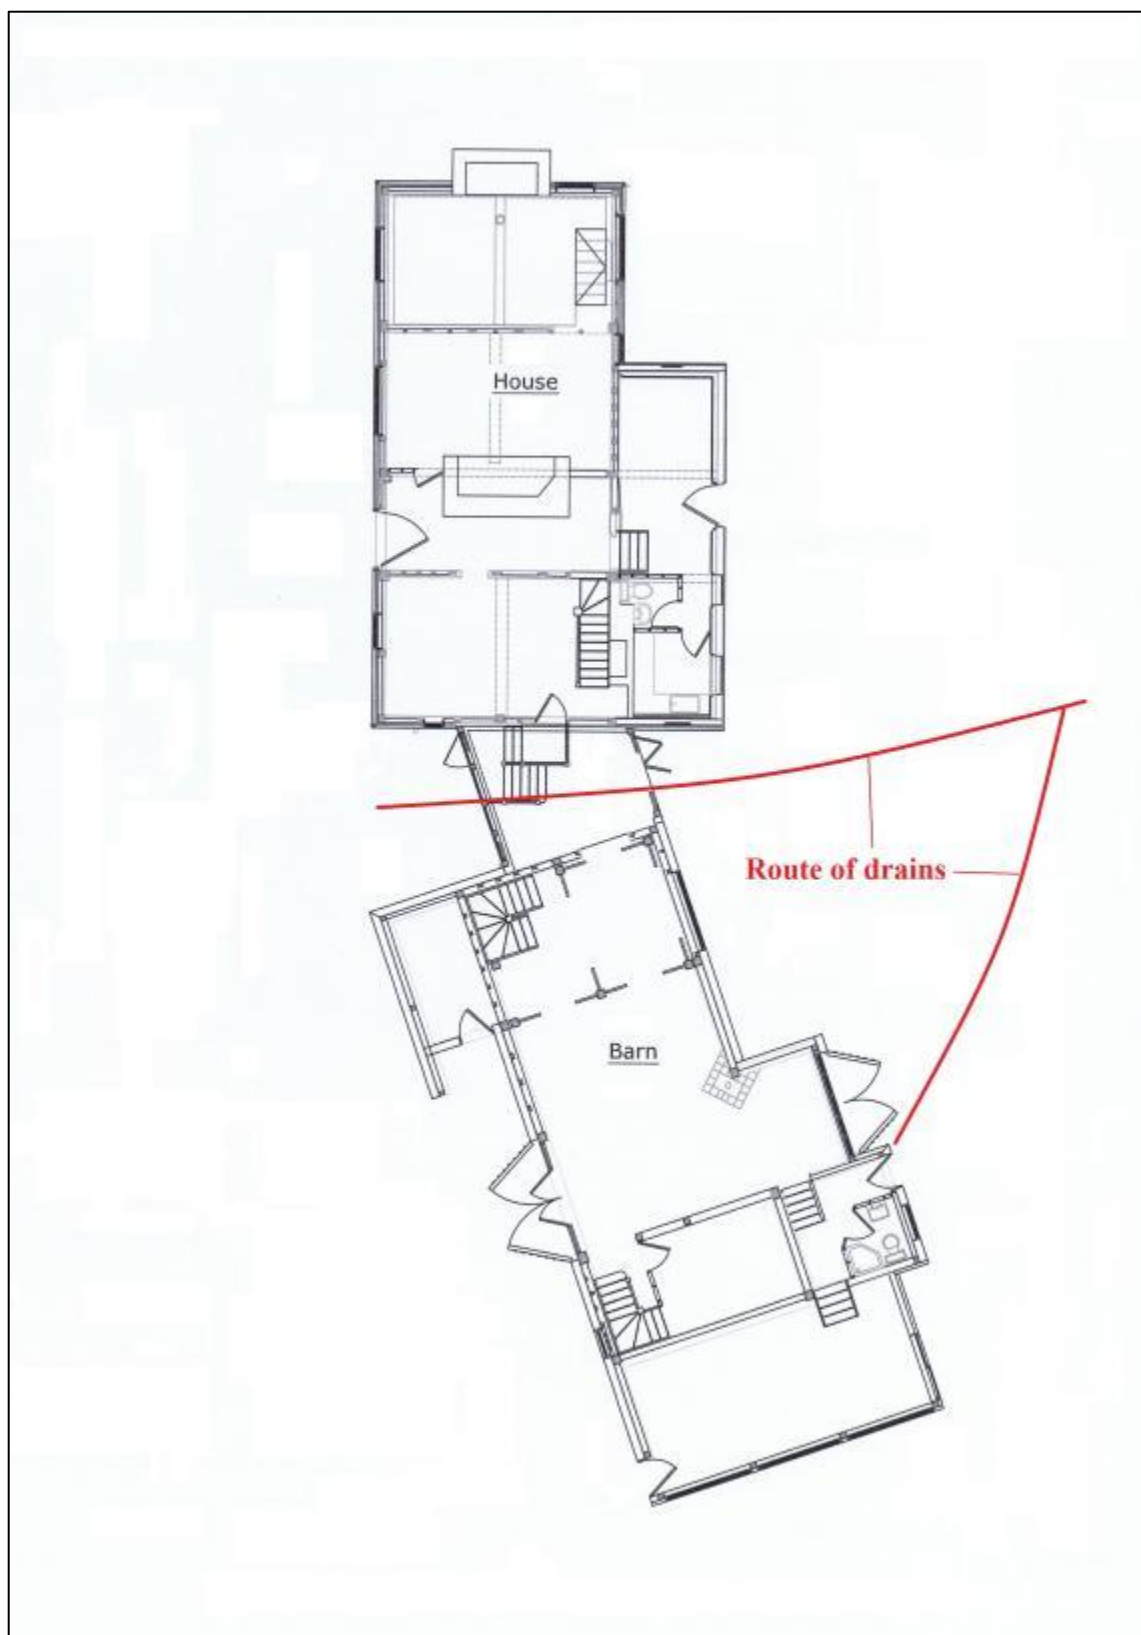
Pococksgate Farm: Plan showing locations of drainage trenches
